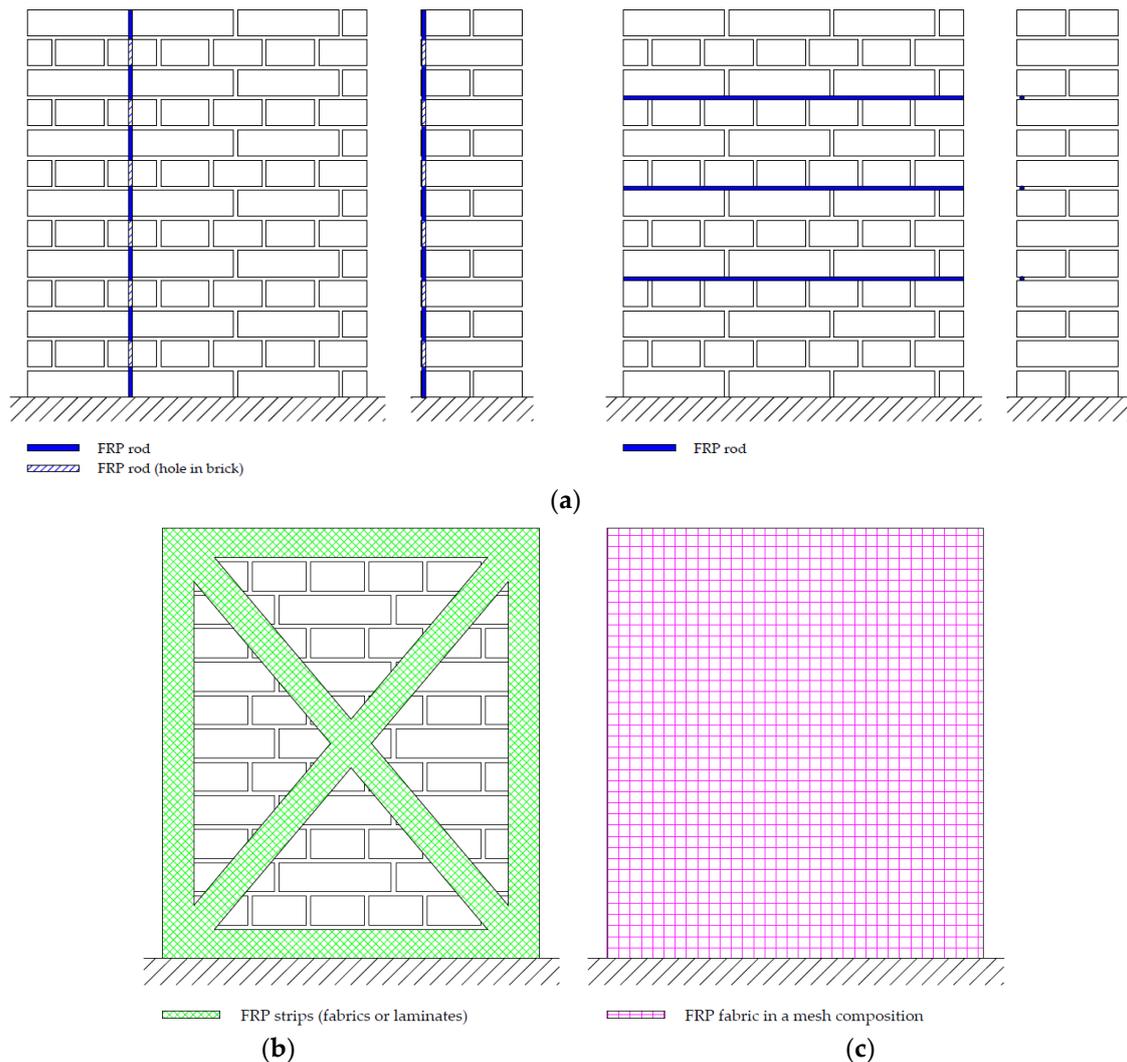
Shapes of FRP reinforcement—(a) FRP rods placed in vertical and horizontal directions. (b) Typical layout of FRP strips. (c) Typical mesh layout of the FRP fabric (entire wall surface).
